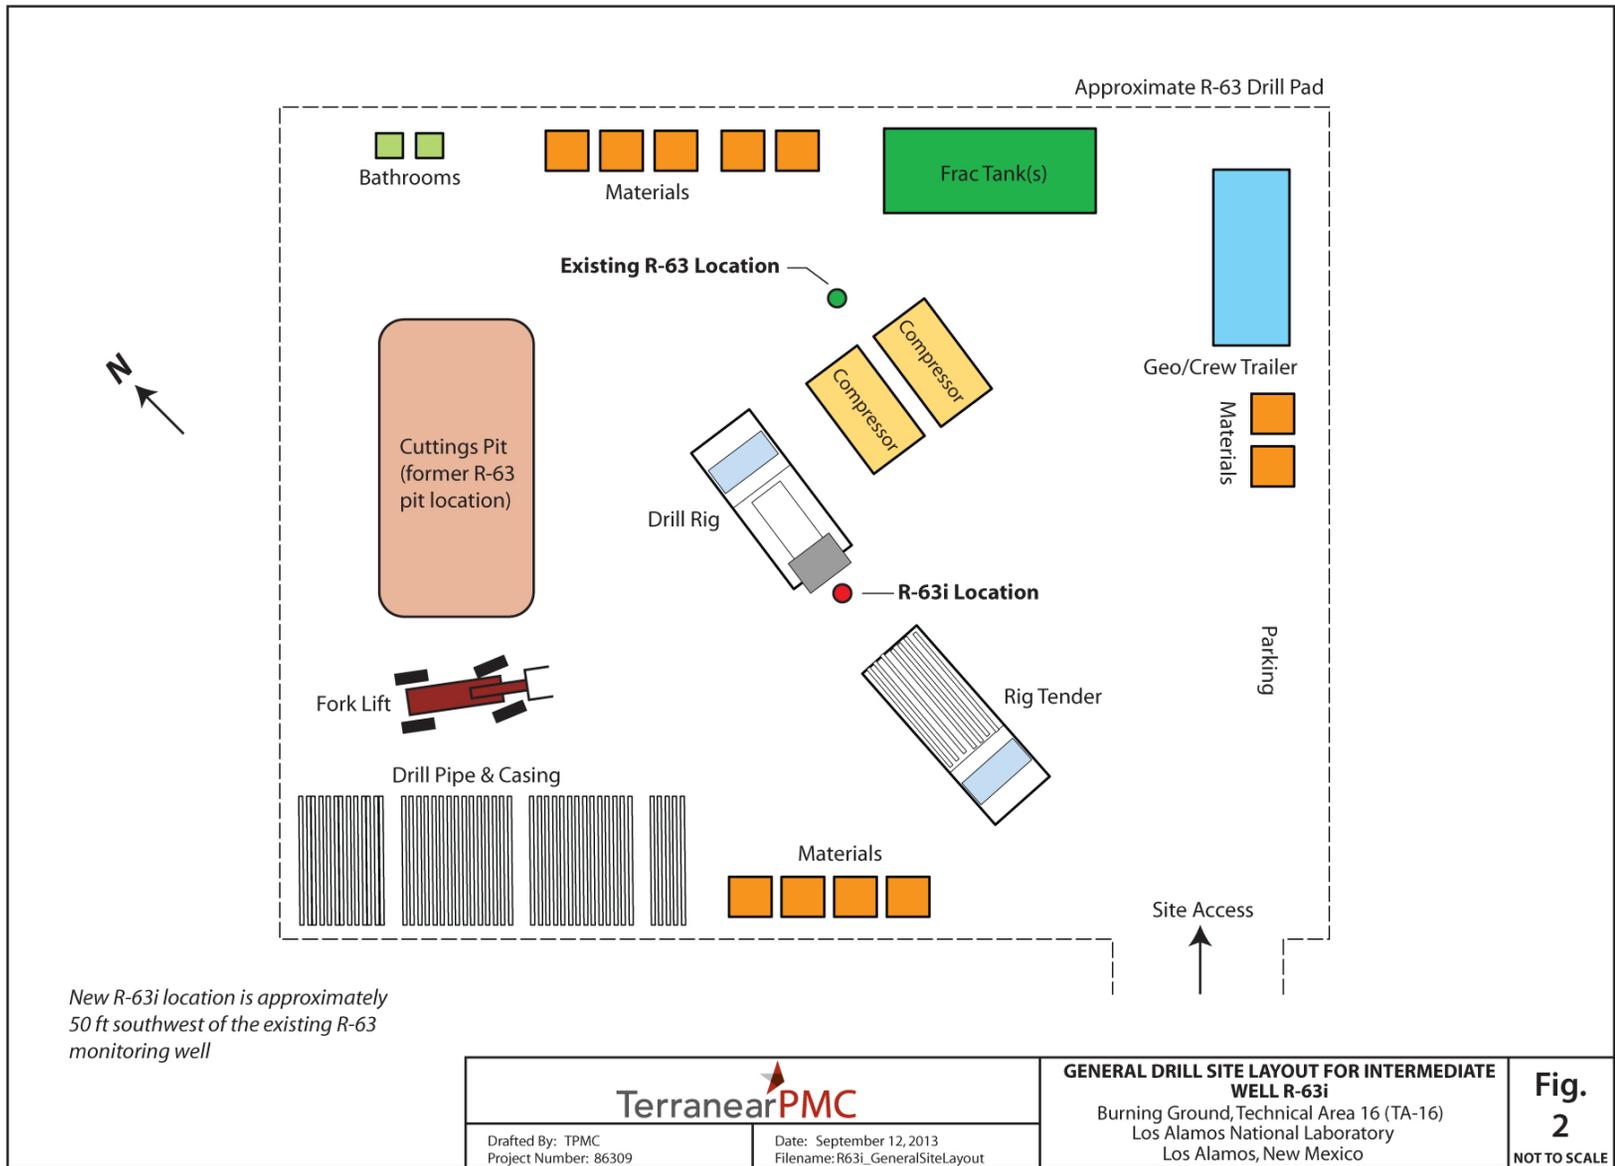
General Drill Site Layout for Intermediate Monitoring Well R-63i
